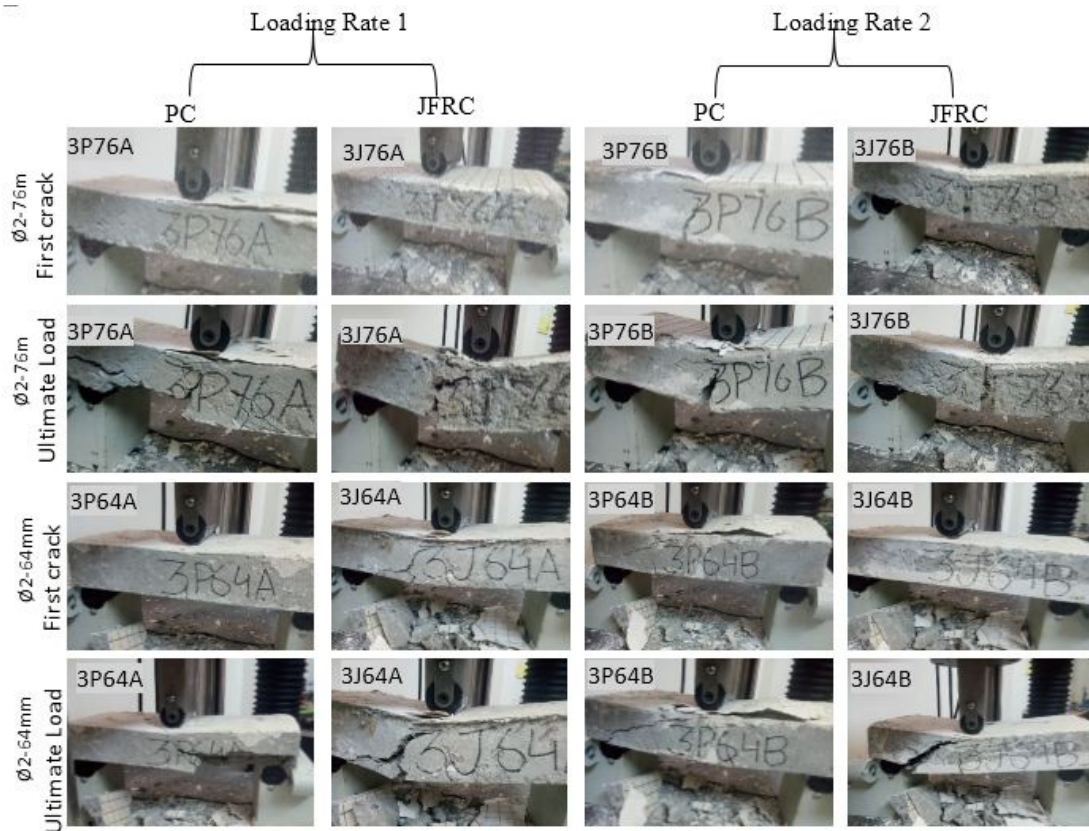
Crack Propagation of PC and JFRC Specimens with changing Flexural rebars
